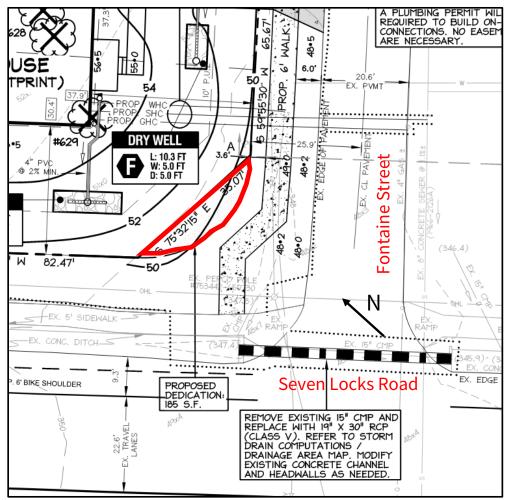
Right-of-way dedication to provide truncation at Seven Locks Road and Fontaine Street
